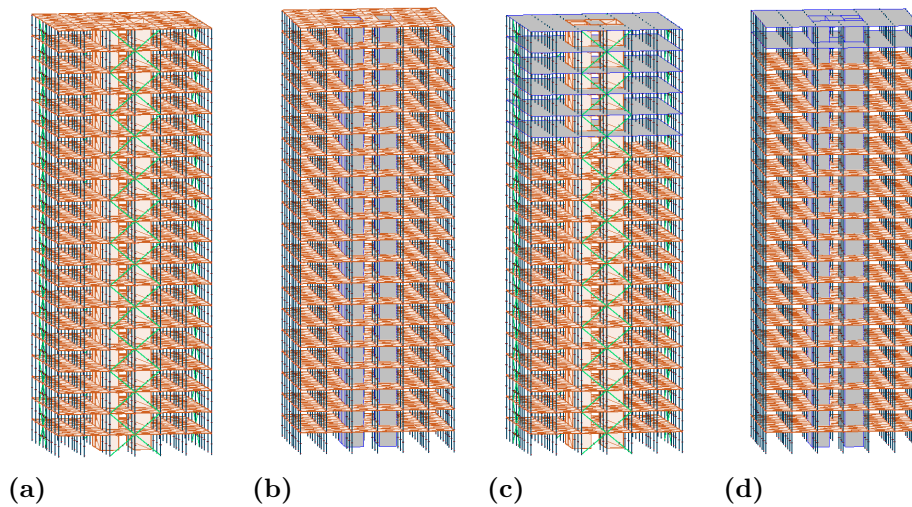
Examples of the 4 different column building types: (a) Col-T, (b) Col-C, (c) Col-F, (d) Col-CF
